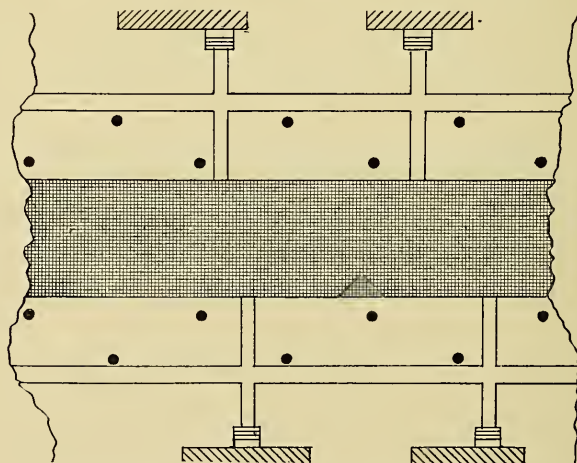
Plan of modern avenue provided with a 40-foot roadbed, 6-foot sidewalks, 23-foot tree belts, with alternating rows of trees 60 feet apart.
